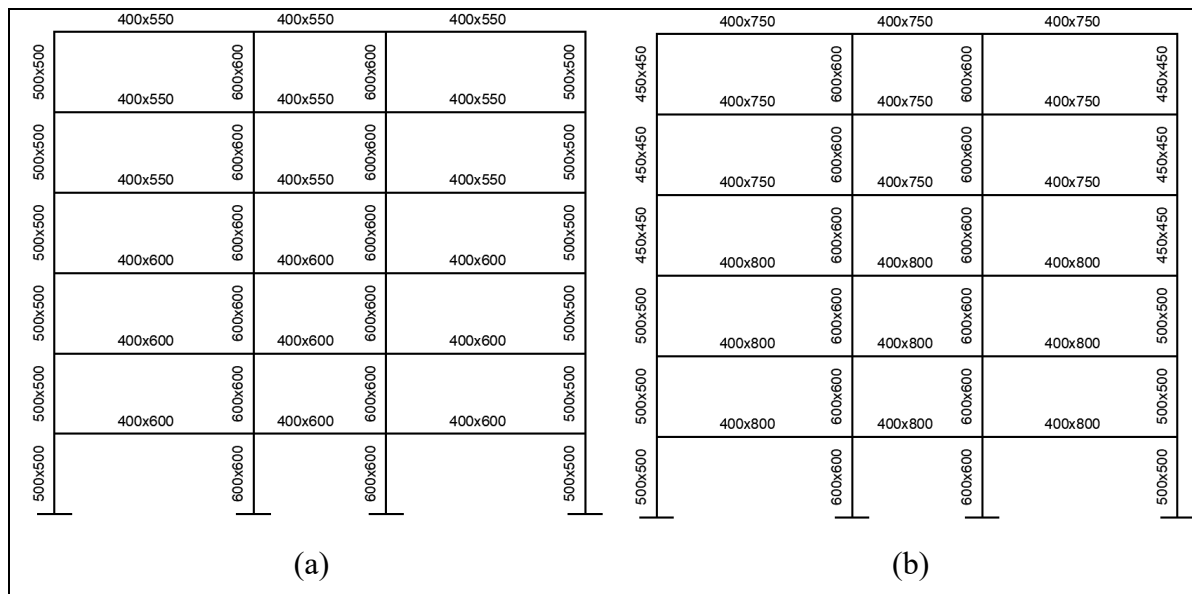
Dimensions of beams and columns for buildings in Montreal
